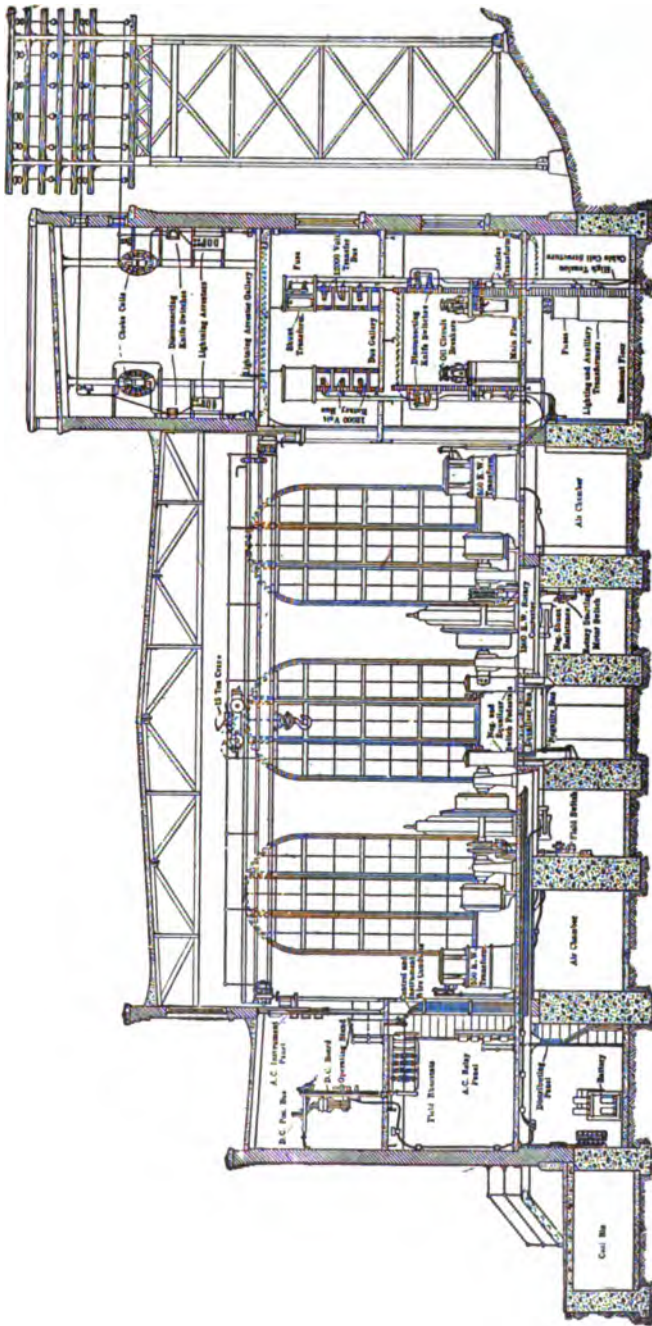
Elevation of Woodhaven Junction Substation, Long Island Railroad. (Westinghouse, Church, Kerr & Co.)
